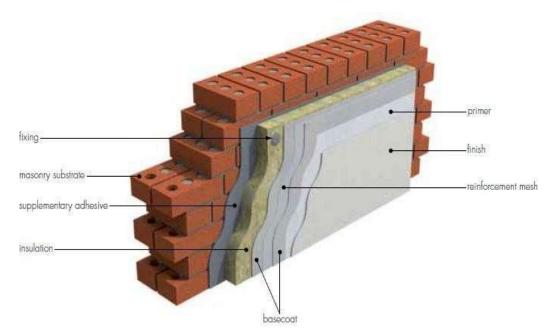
SPS Envirowal Wall System 1 for existing masonry wall
